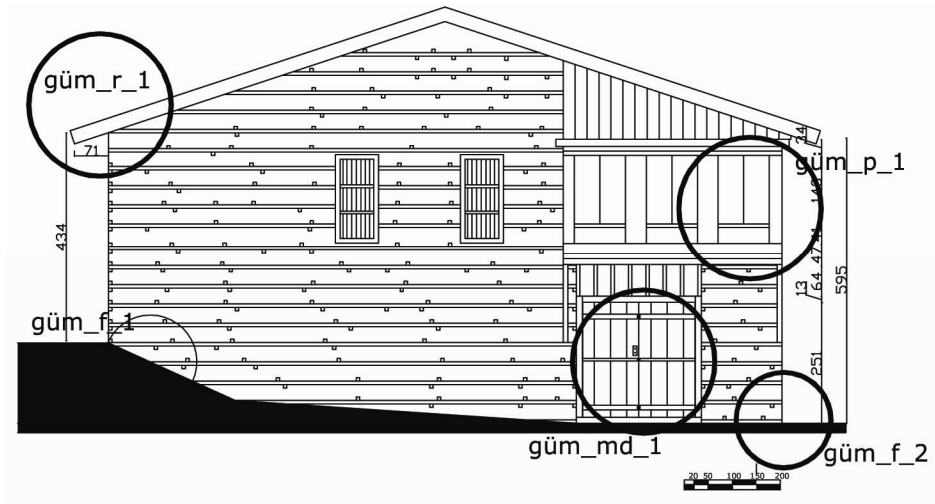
The drawing of the south-west façade of Gümüşler House. Çelik, 2008.
